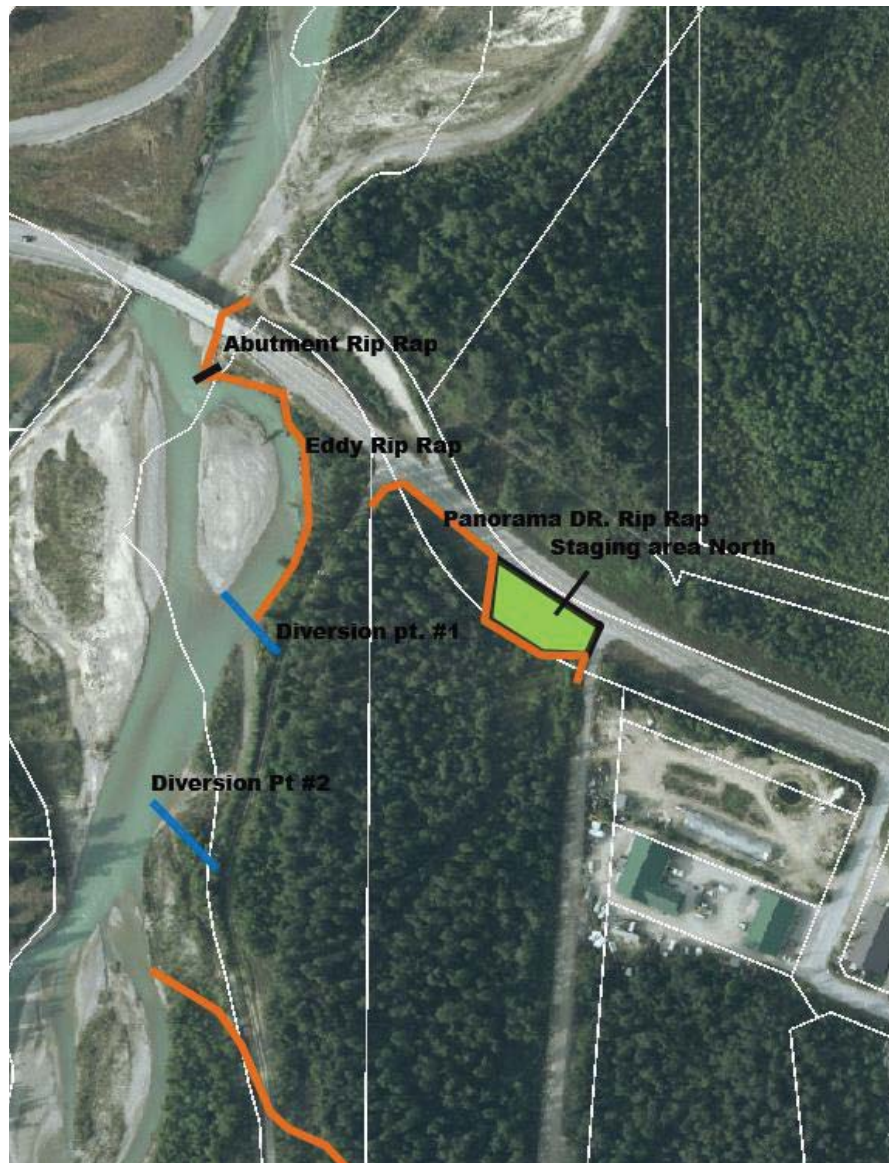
Proposed works at north end including marshalling/staging area, bridge and eddy section rip rap armouring, and two northern diversion structures.
